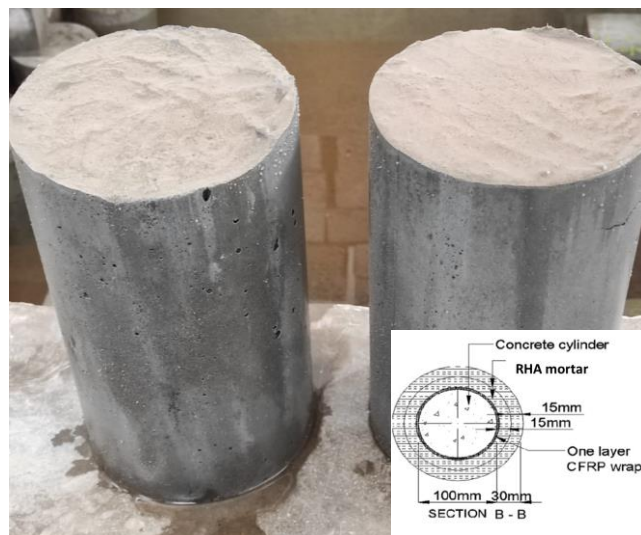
Concrete cylinder with CFRP wrapped with RHA plaster
